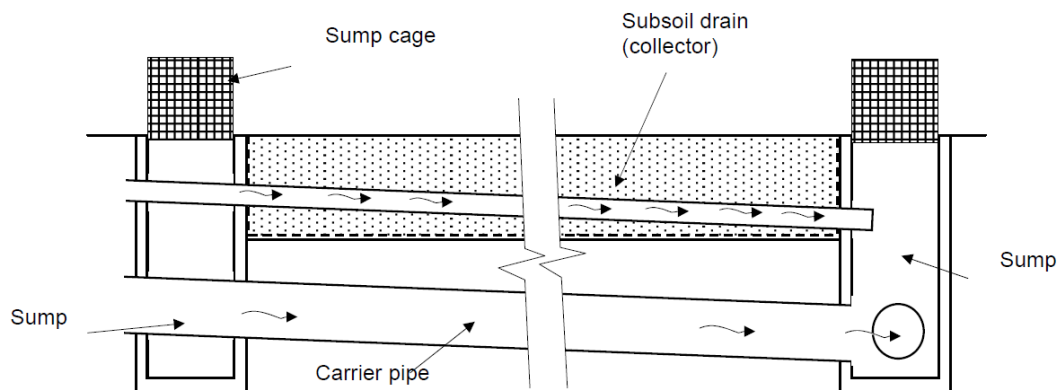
Subsoil collector drain plus a larger carrier pipe
